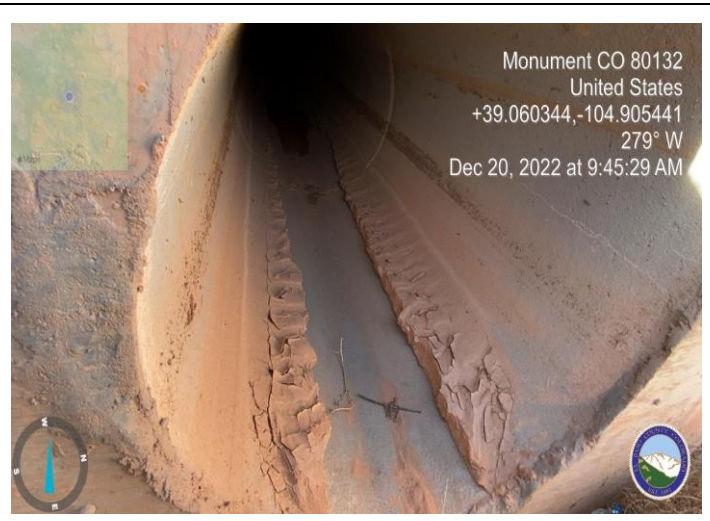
Remove sediment from 42" culvert that outfalls at southwestern forebay. (Reference Sheet 22 of CD's)
